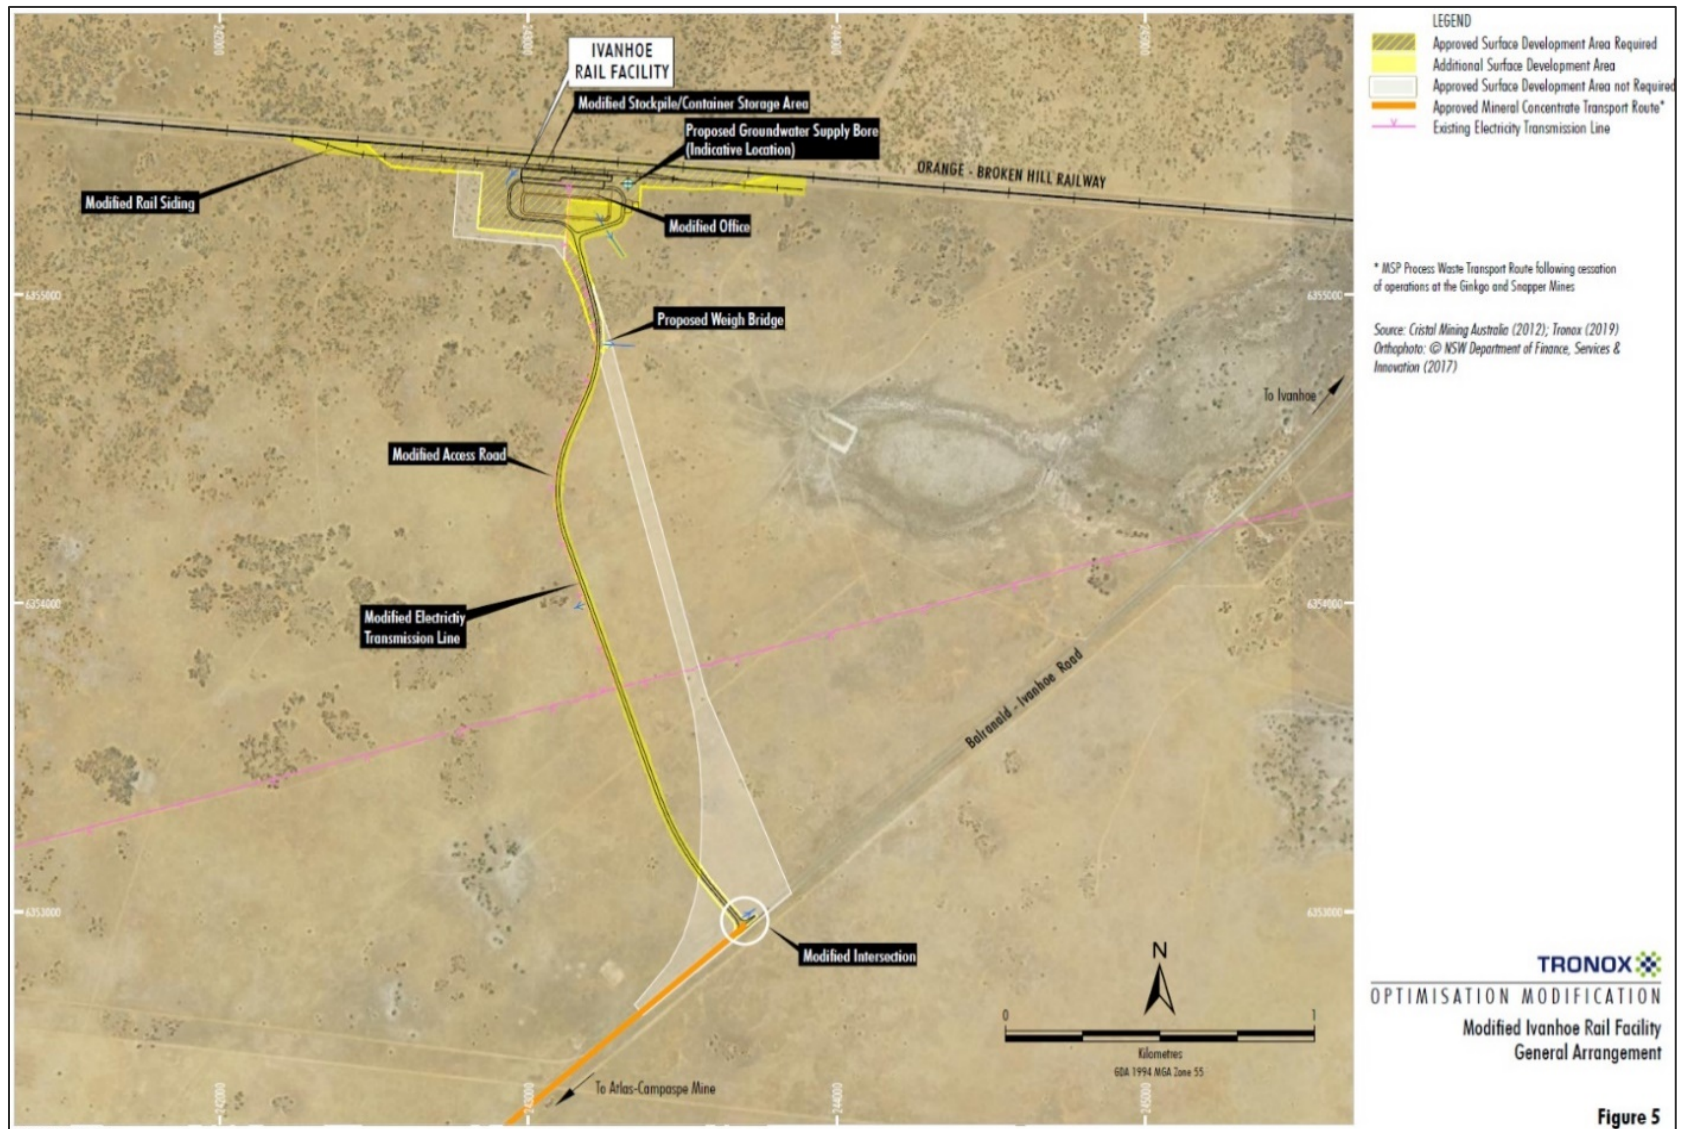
| Proposed modifications to the Ivanhoe Rail Facility
